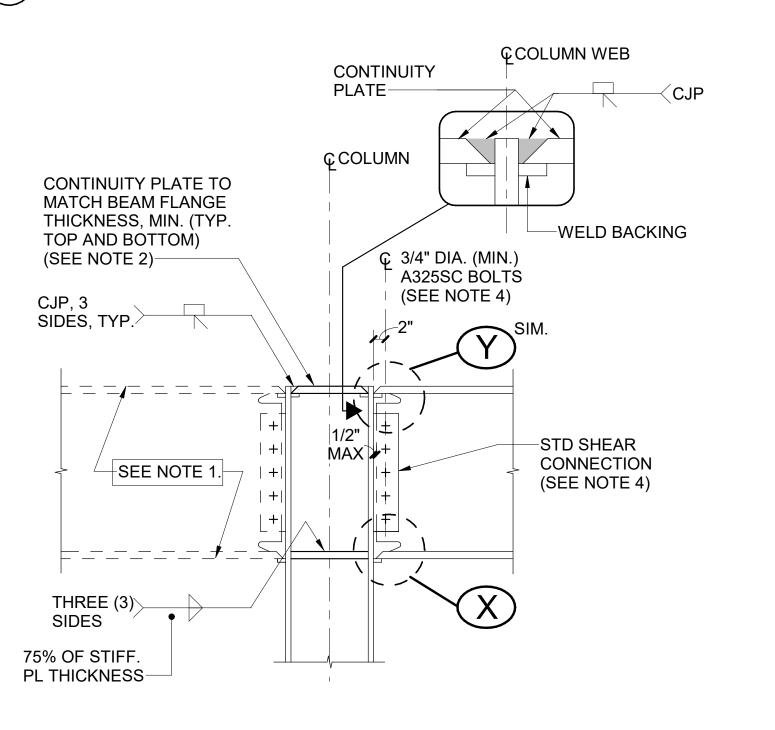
DETAIL AT ROOF WITHOUT DOUBLER PLATES
